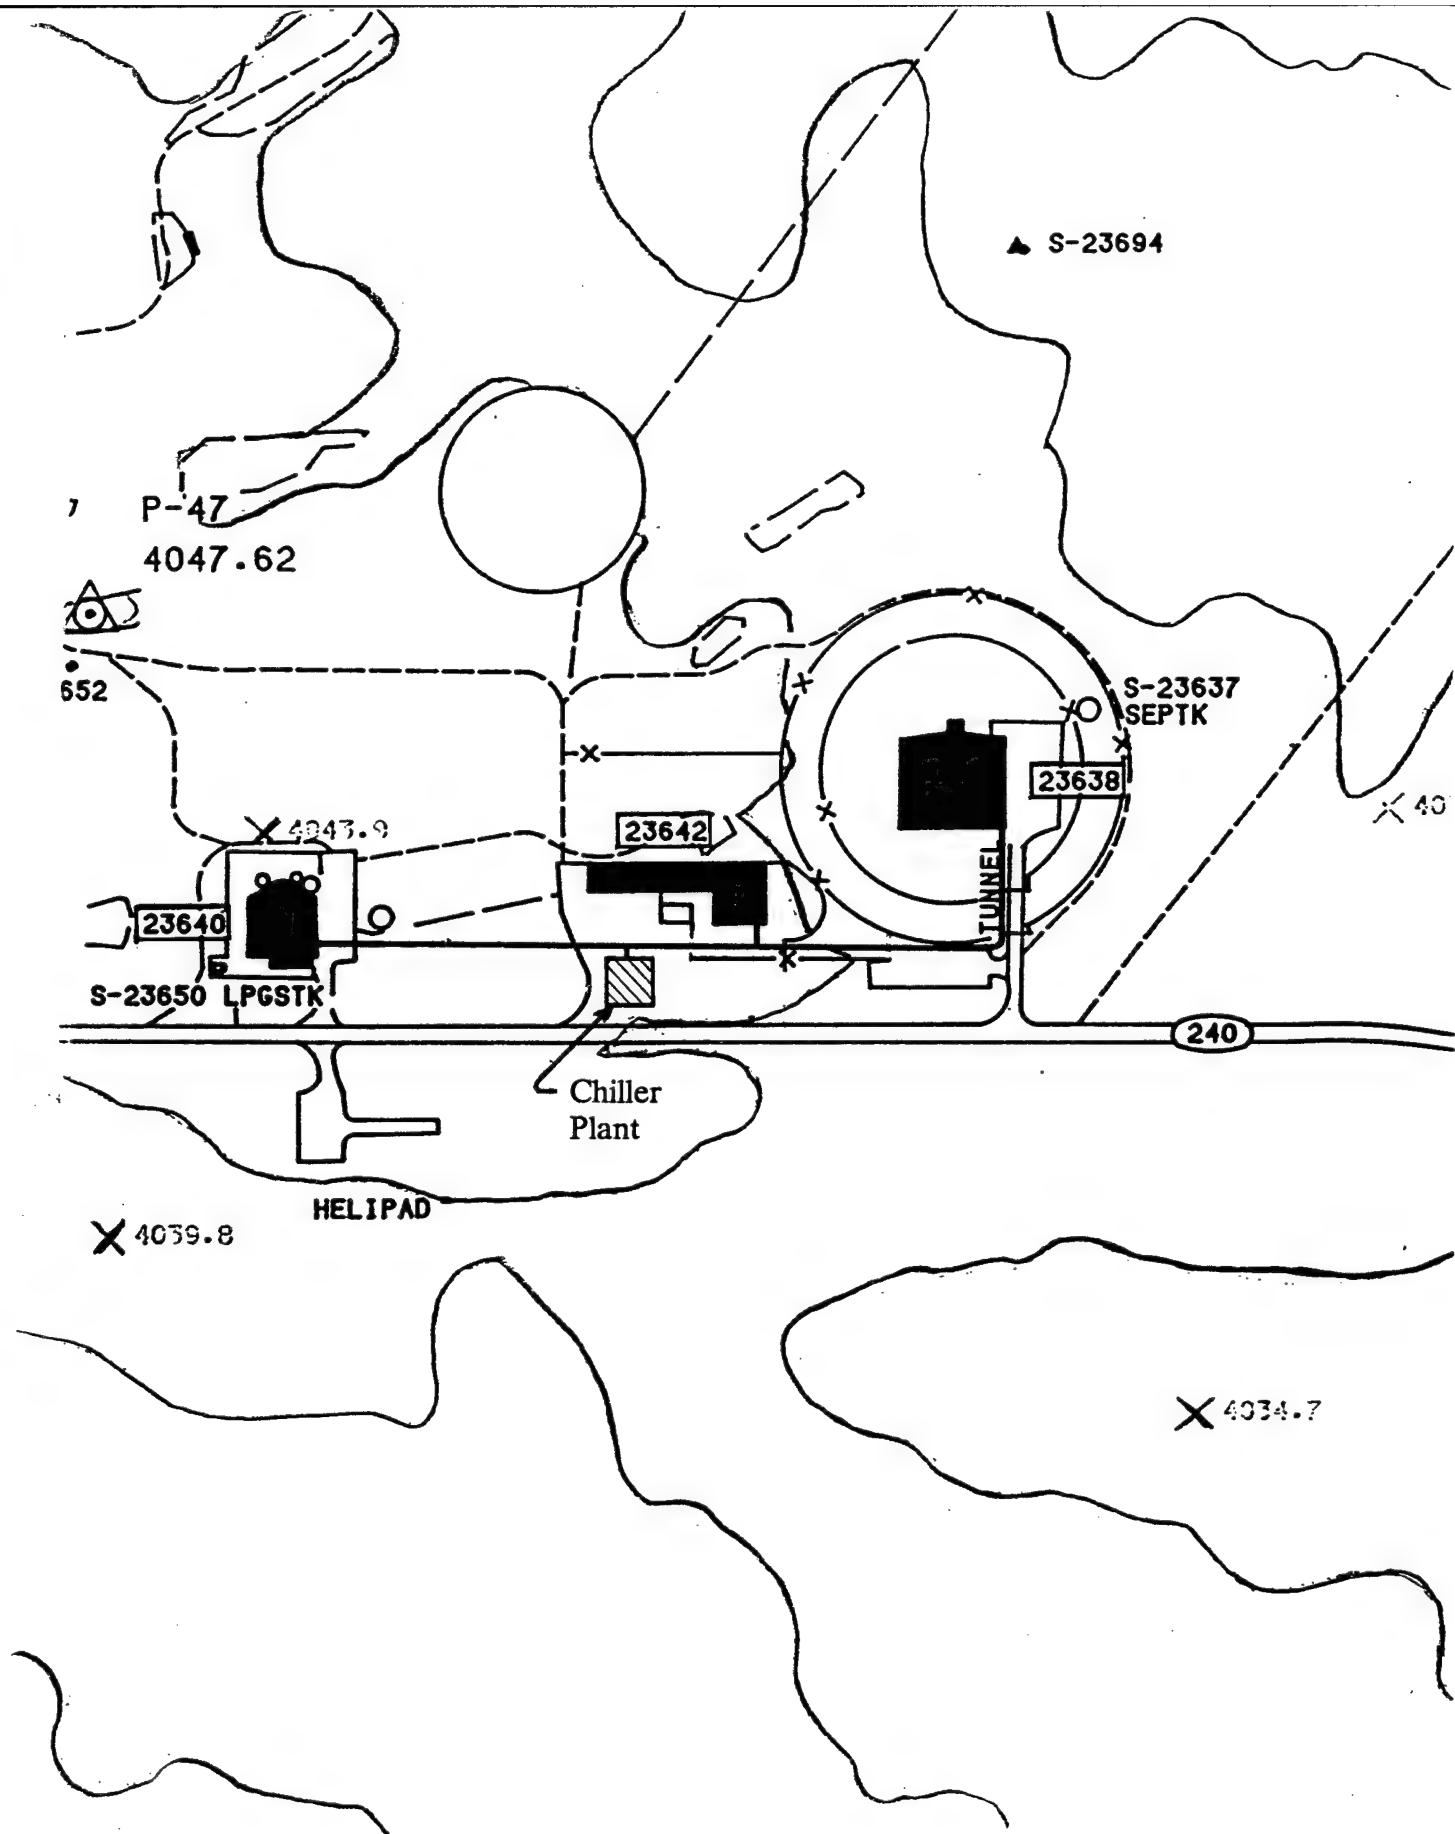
ALTERNATIVES 2A AND 2B SITE PLAN AND LAYOUT
